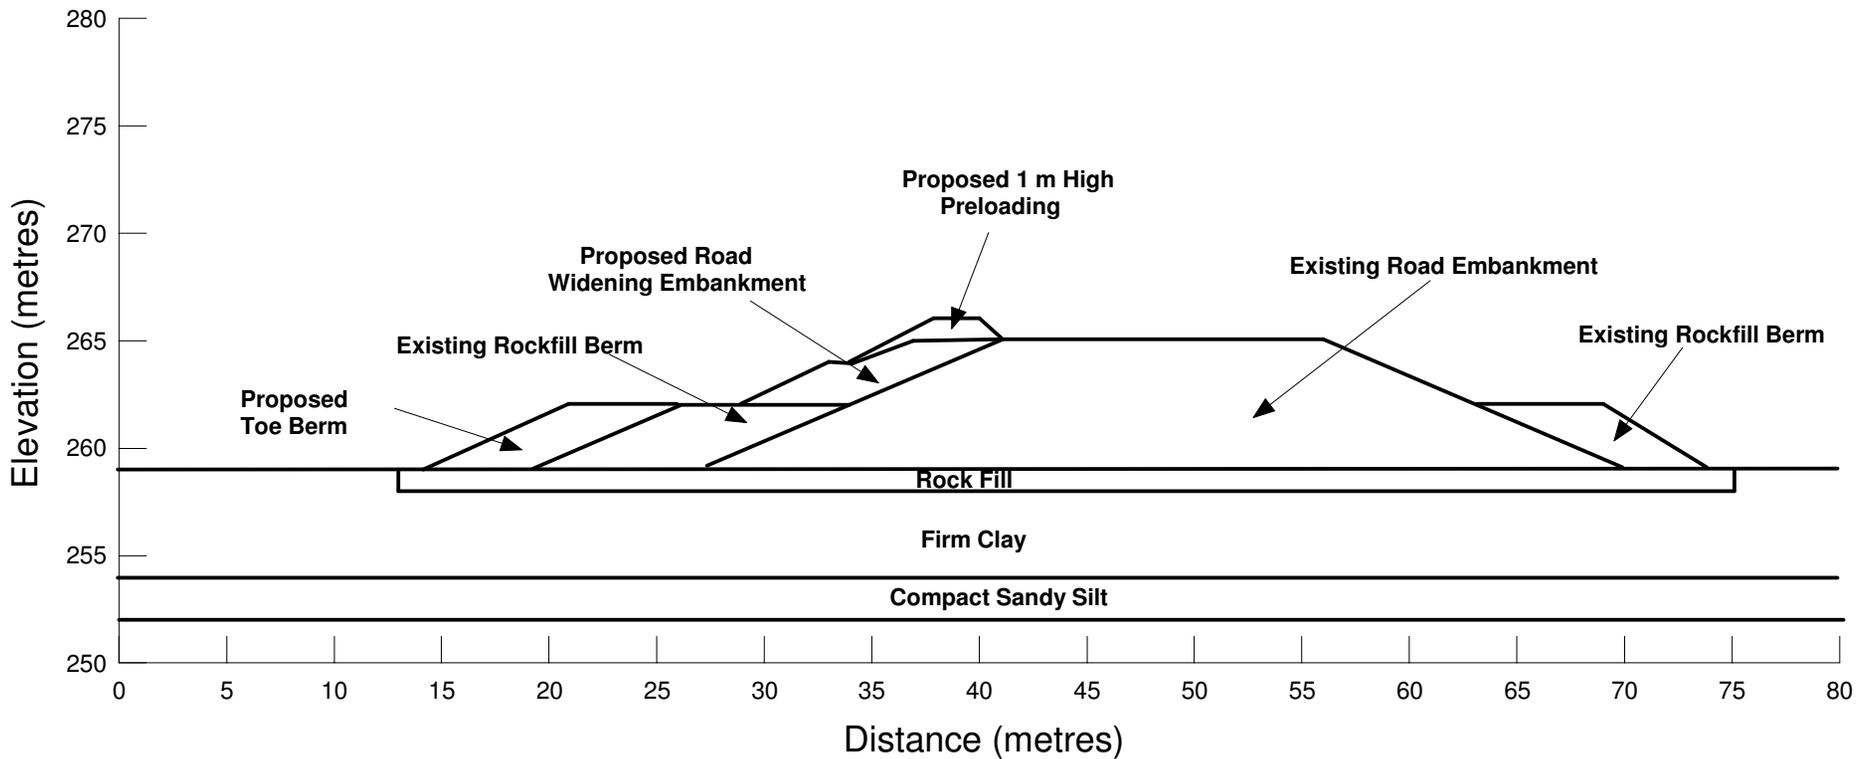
Embankment Configuration and Soil Profiles - Road Widening with 1 m Preloading at Station 18+875
